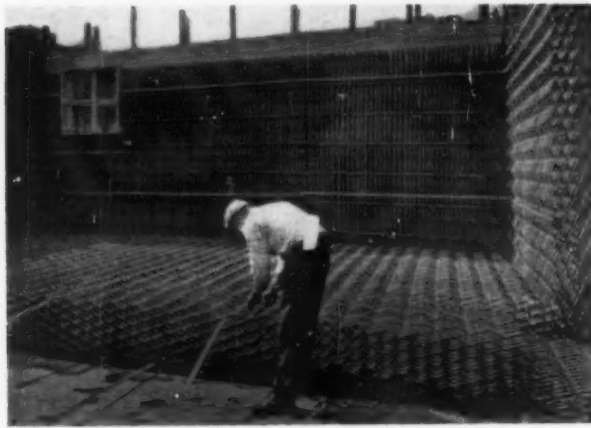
Wall Reinforcing Placed on End. Bars Through the Meshes
